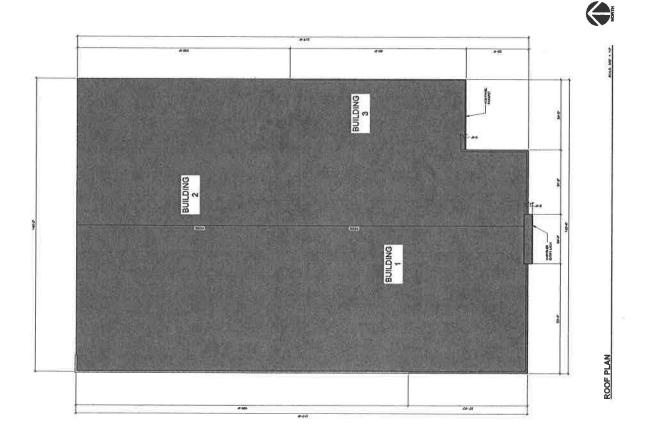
Exhibit E Roof Plan PD 13-006 & CUP 13-008 (Mullahey Chrysler)
